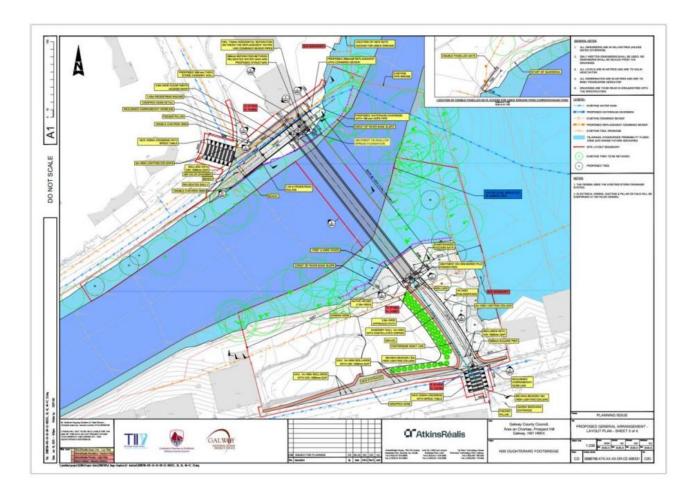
Proposed Development layout plan of the Oughterard Pedestrian Bridge
